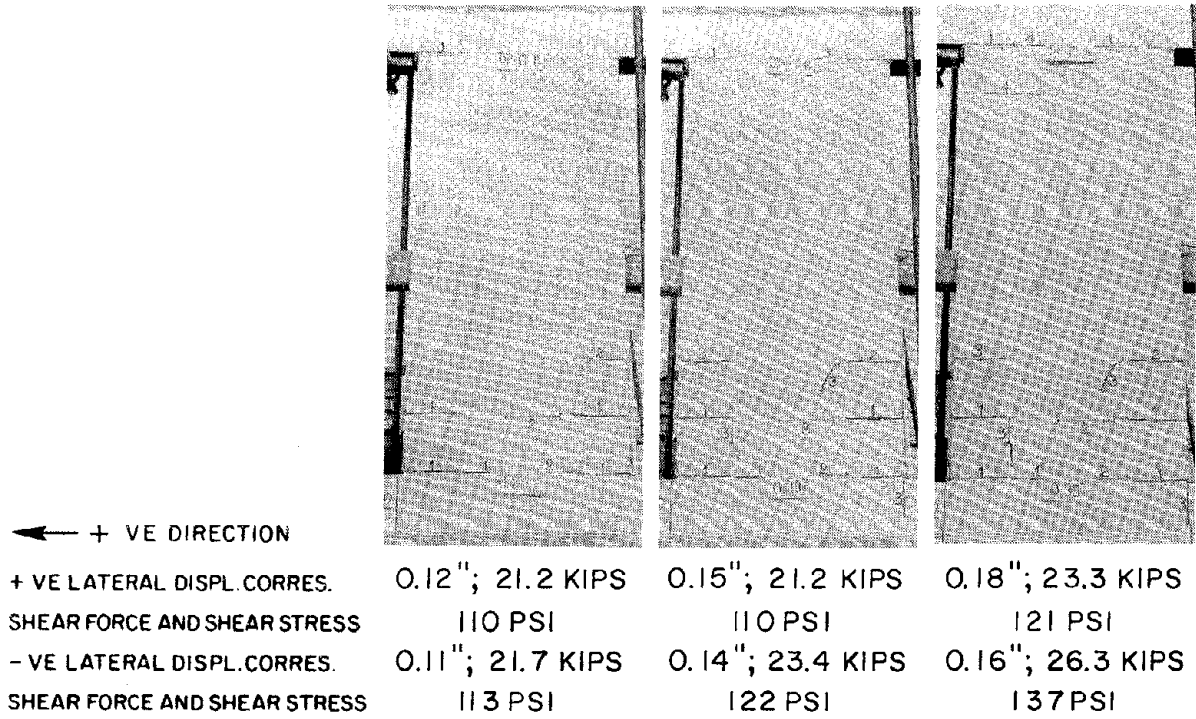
SUCCESSIVE CRACK FORMATION TEST 14. (RIGHT SIDE PIER)
